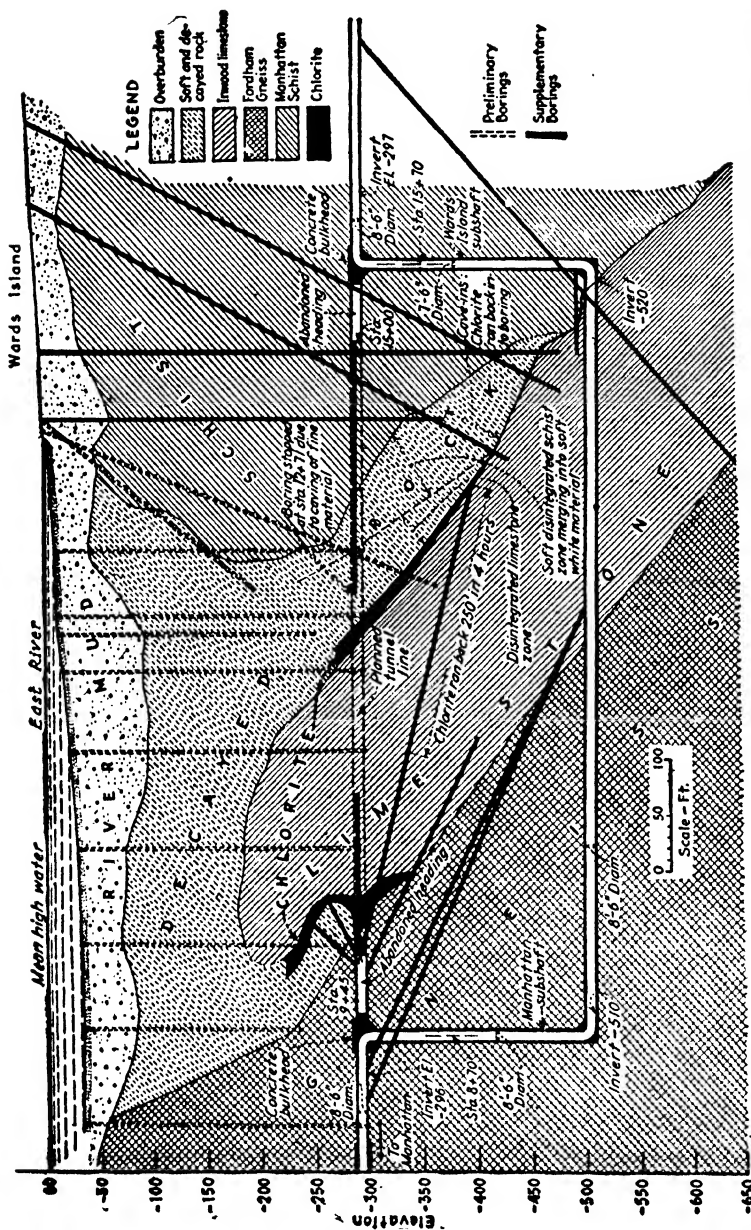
Extensive core drilling on Wards Island sewer tunnel under the East River, New York, showed the way to get under a bad fault that stopped driving on original upper level tunnel. Preliminary borings failed to reveal true conditions.
